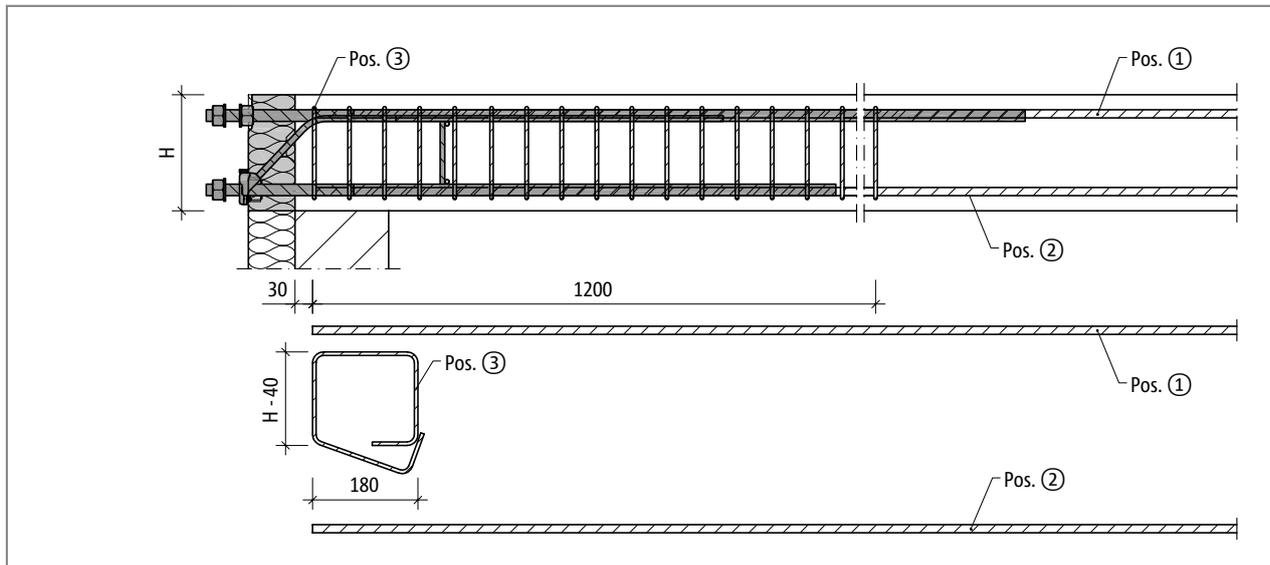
Schöck Isokorb® T type SK-MM2: On-site reinforcement with stirrup \varnothing 6 mm; cross-section
